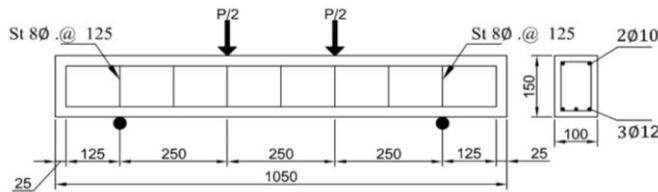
Test Specimens of Groups (1, 2, 3) (Reinforced concrete beam)
